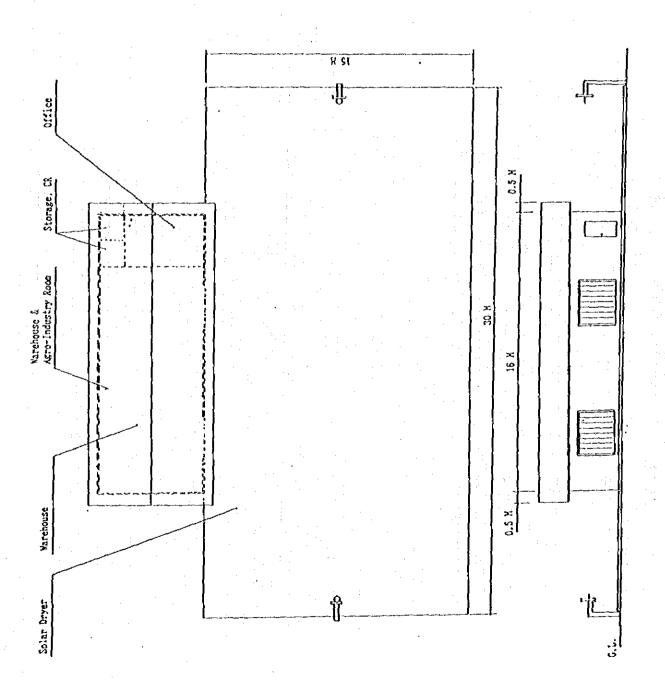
PROPOSED PLAN OF RICE OR CORN AGRO-INDUSTRY CENTER
